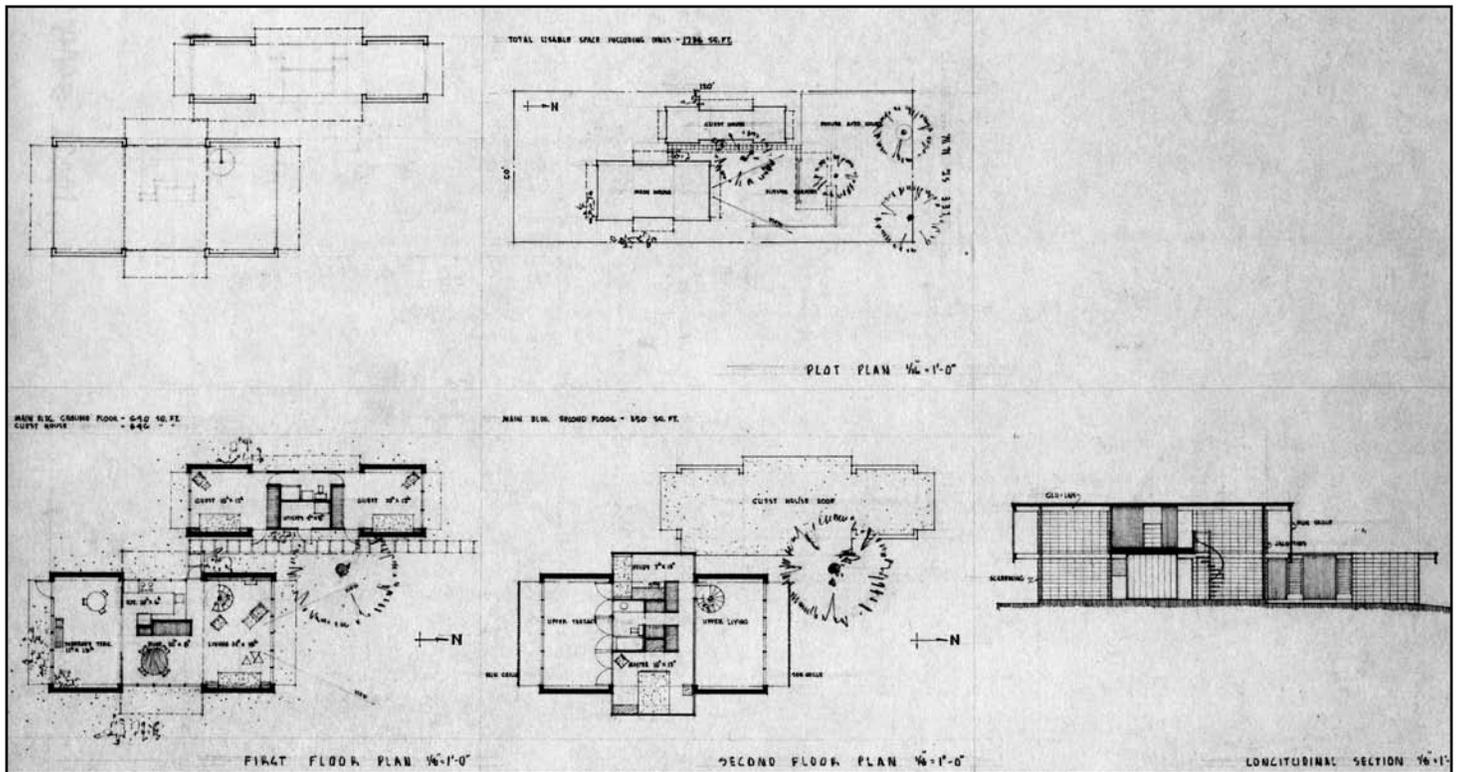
The Wicker House floor plan (built 1959), [Charles Reed, Jr. collection]
